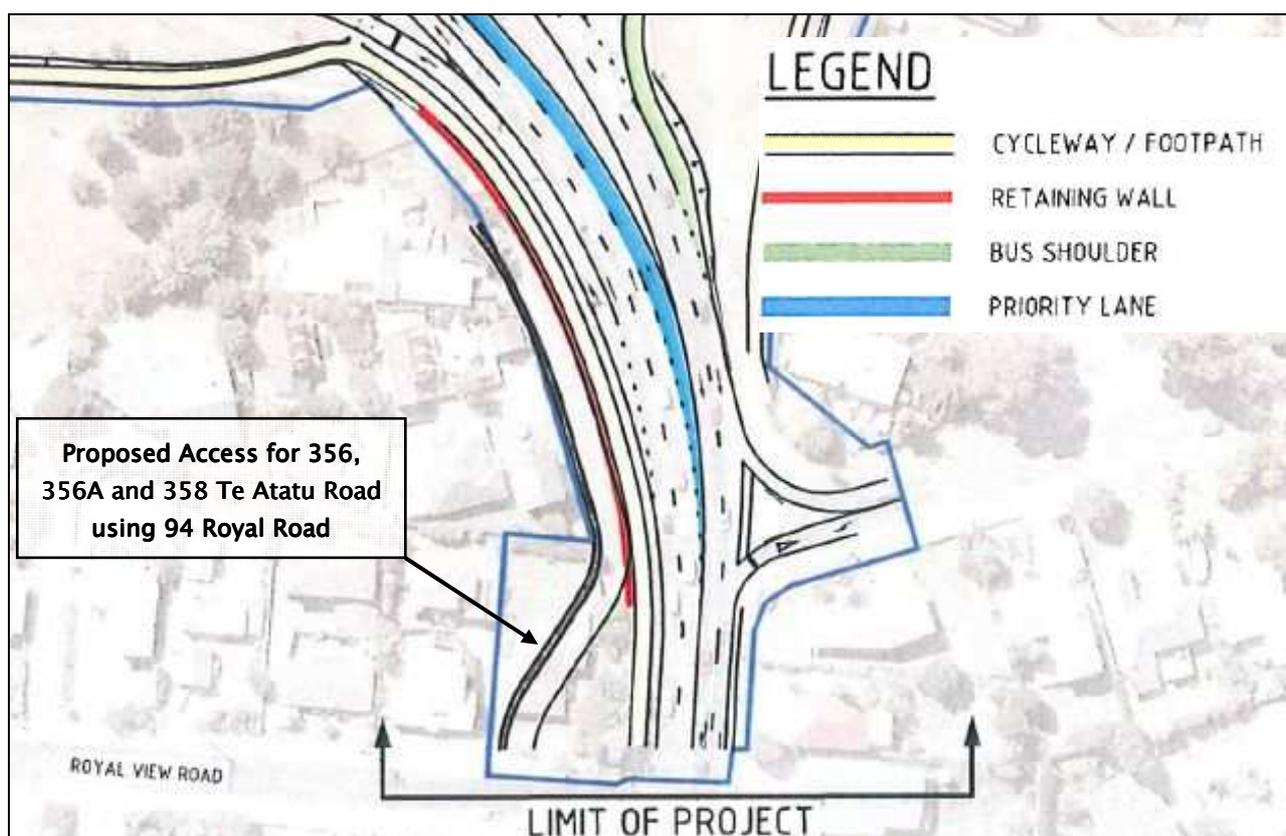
Proposed Property Access for Properties on Te Atatu Road
